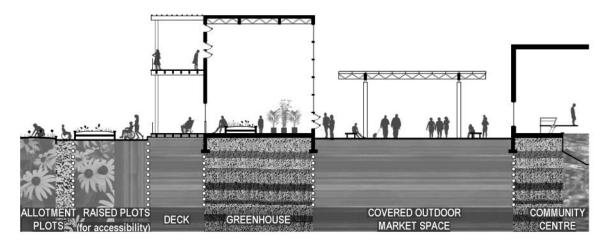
DETAIL SECTION C - 1:300 (Figure 3.2-22)
